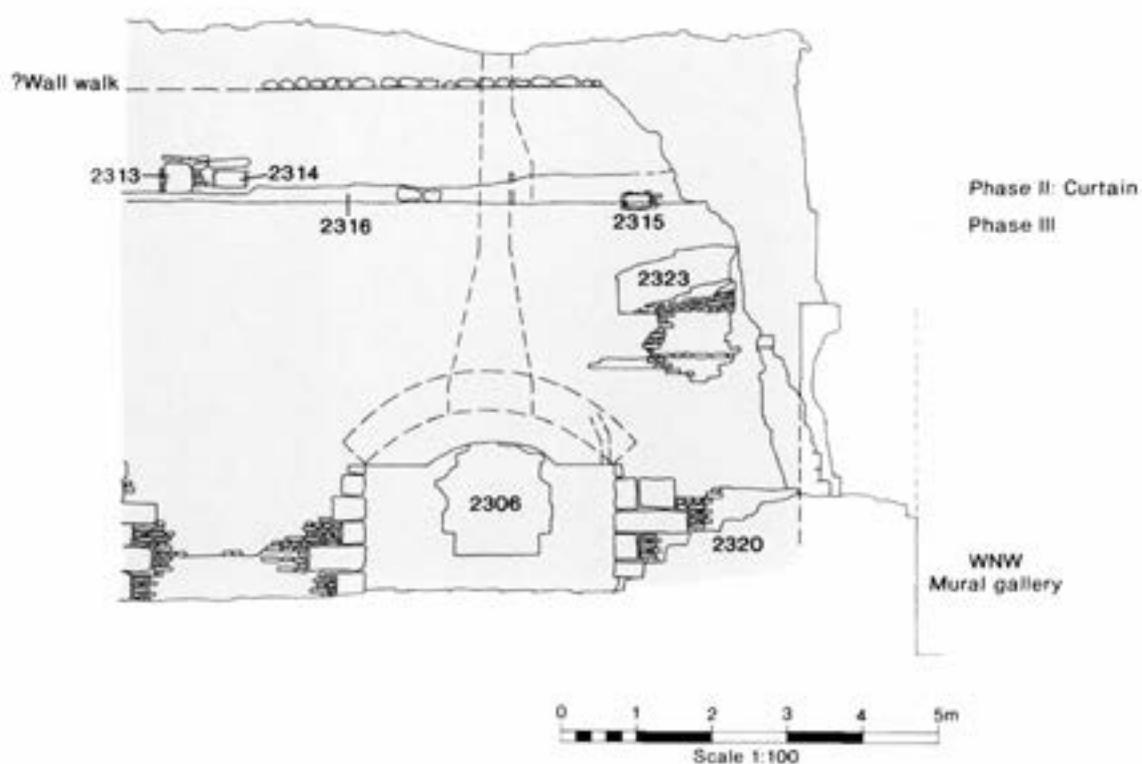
W Bastion: elevation of interior face of north wall
